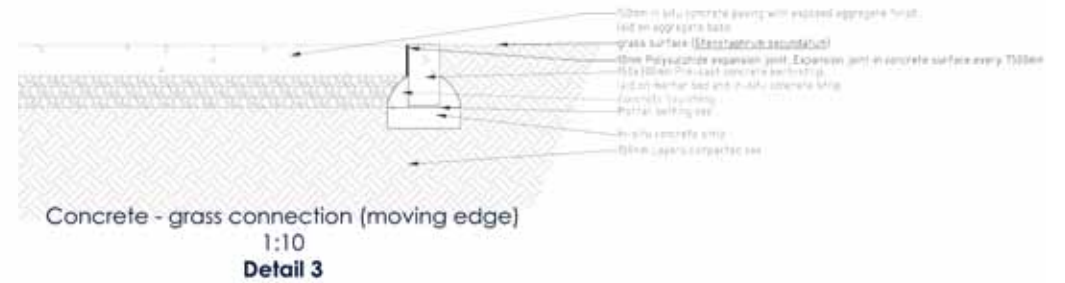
CONCRETE - GRASS CONNECTION (MOVING EDGE) (not to scale) (AUTHOR, 2011)
